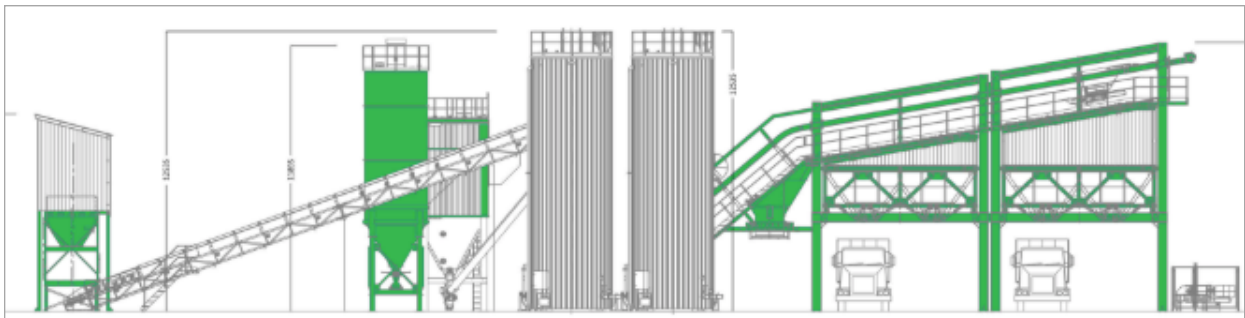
Application drawing KD.CRW.1.D.010 shows the plant's south elevation
